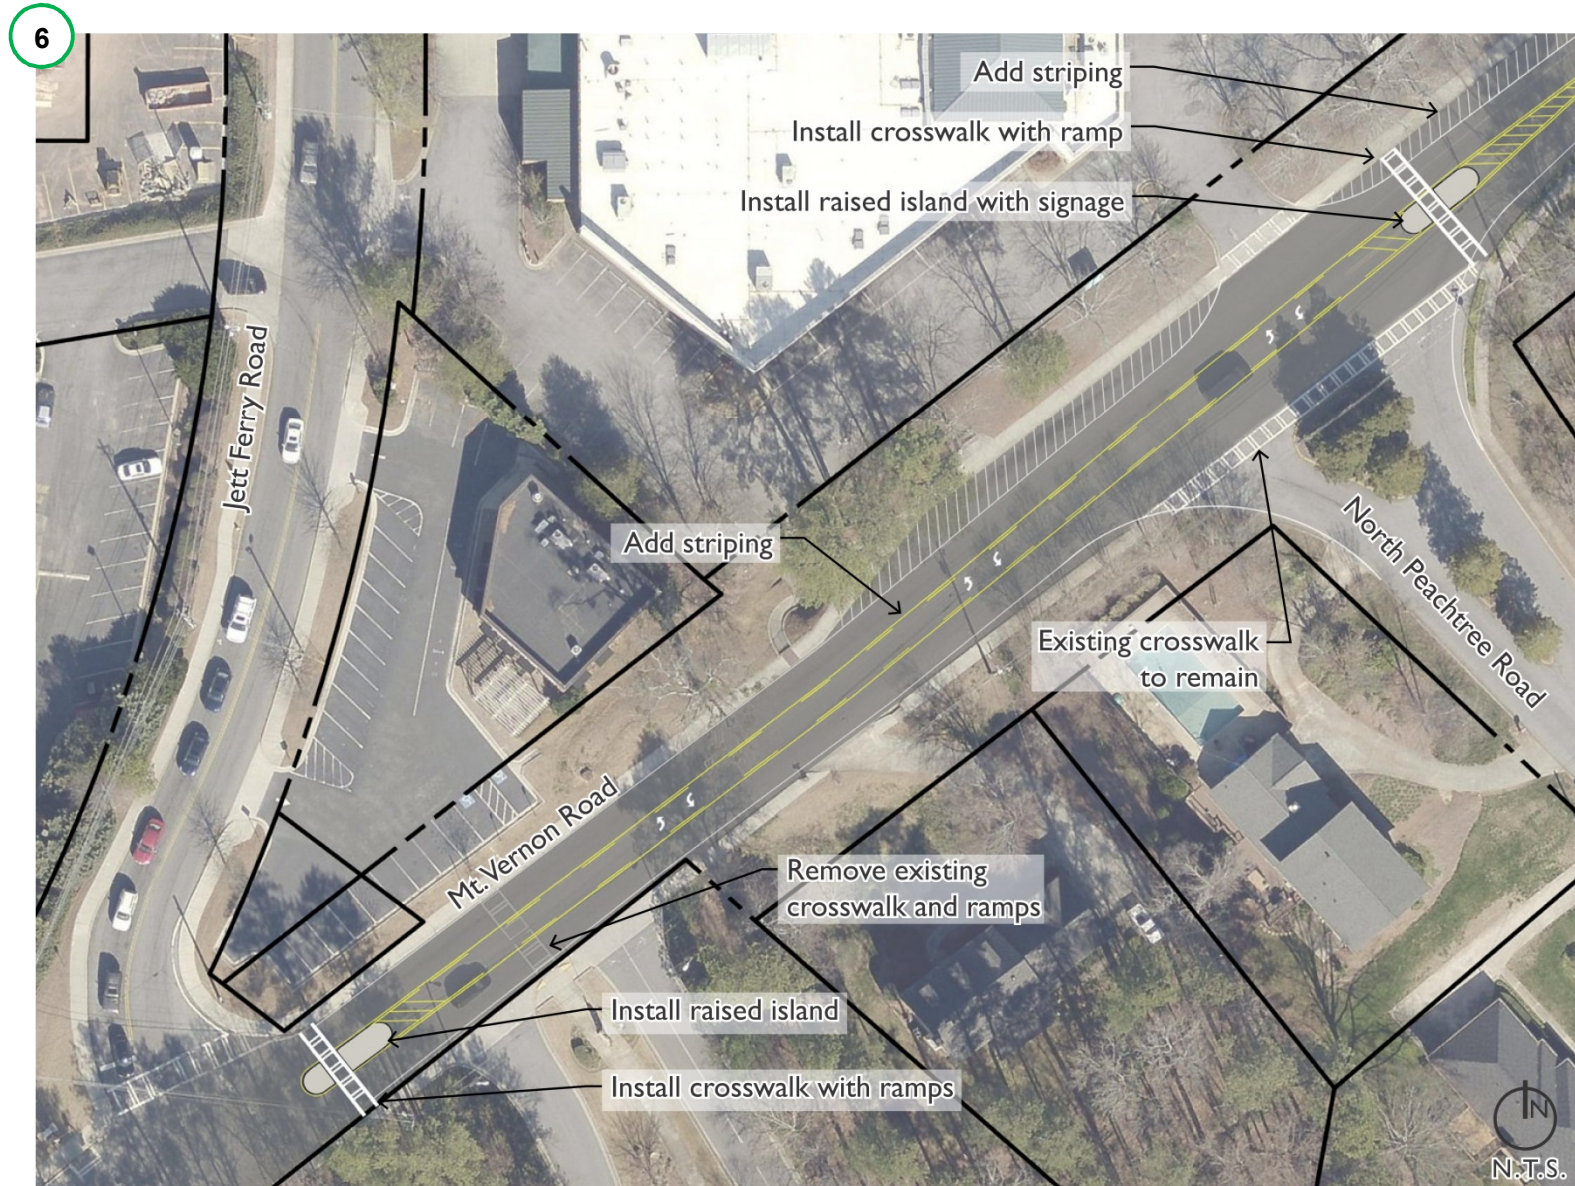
Mount Vernon Road at All Saints Church Driveway Concept
